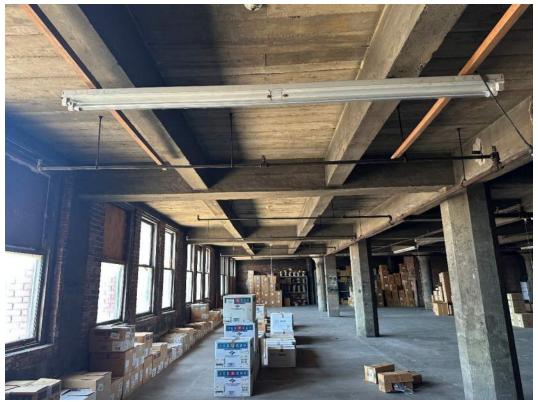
2025 Photograph – fifth floor. Credit: Thomas Porter Architects
